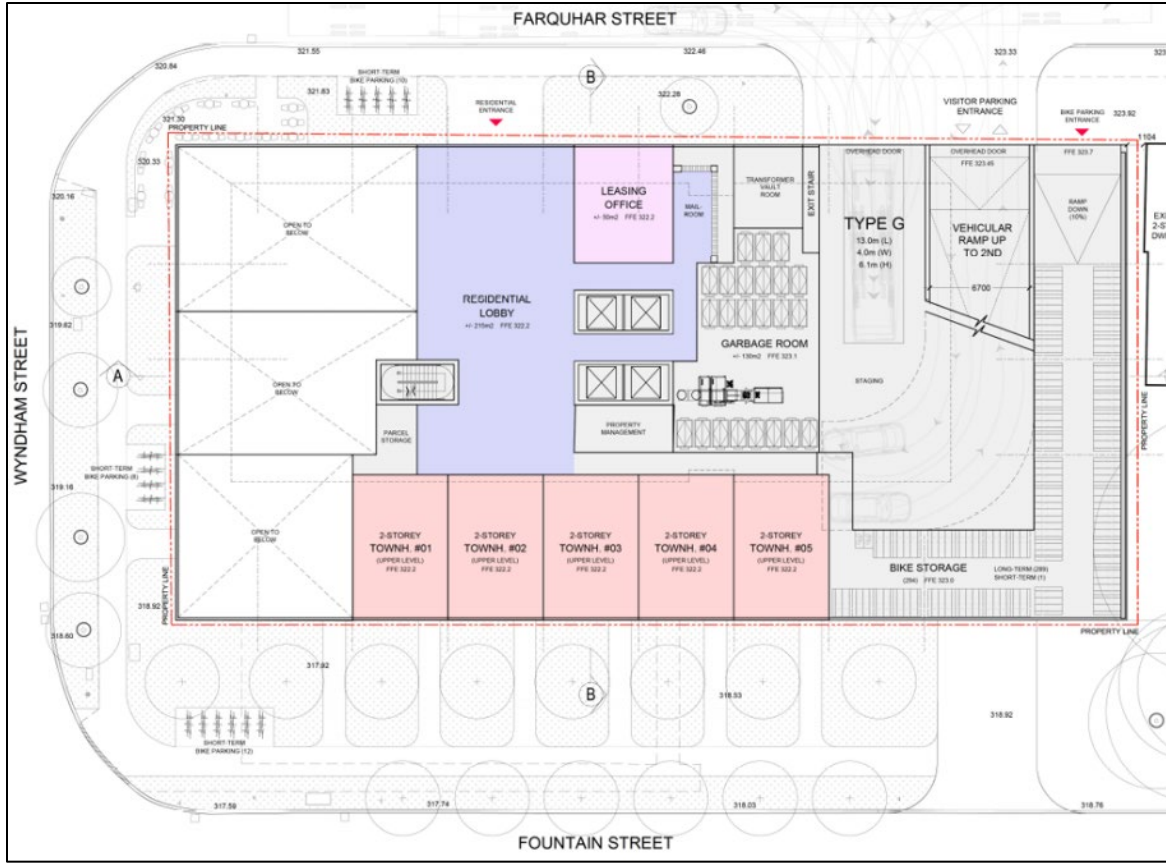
Upper Ground Floor Plan (Source: Hariri Pontarini Architects)
